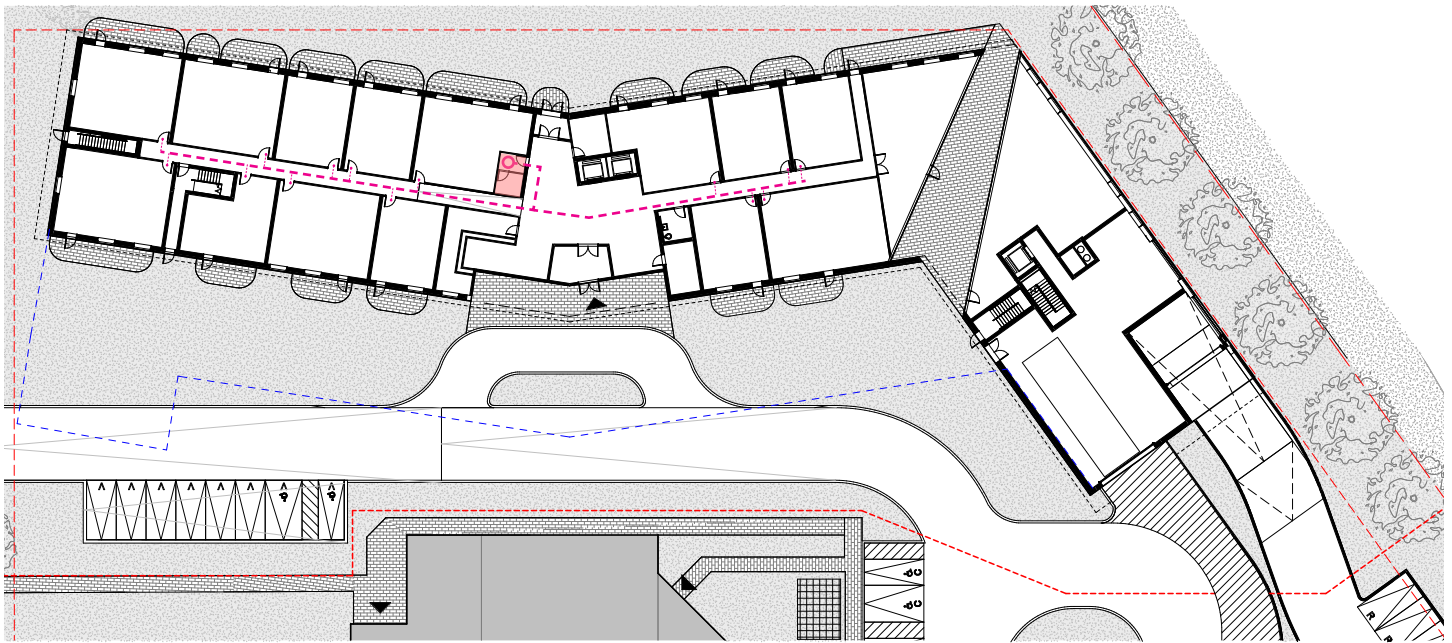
Ground floor residential waste disposal and storage. Building operations waste relocation route and main storage adjacent to loading bay.
